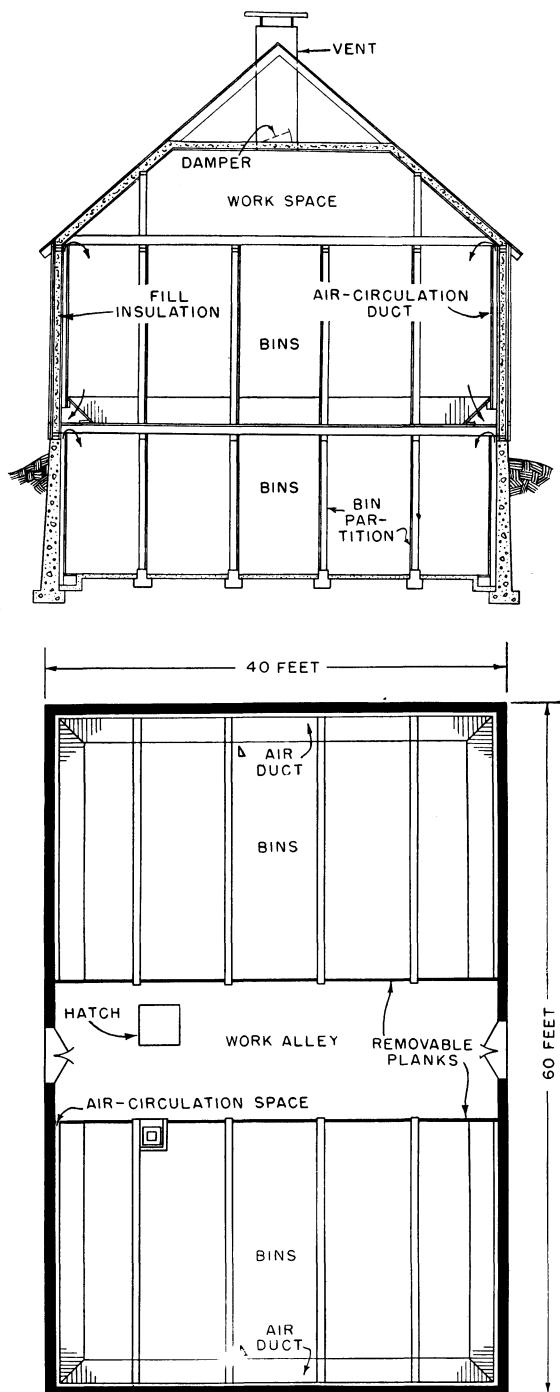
Floor plan (below) and cross section (above) of Maine-type 32,000-bushel trackside storage. Exchange Plan No. 5647.
